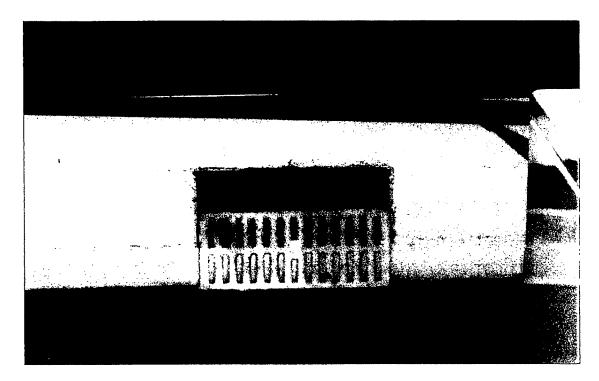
Air Vent on the laundry-boiler room common wall (Bldg 12)
